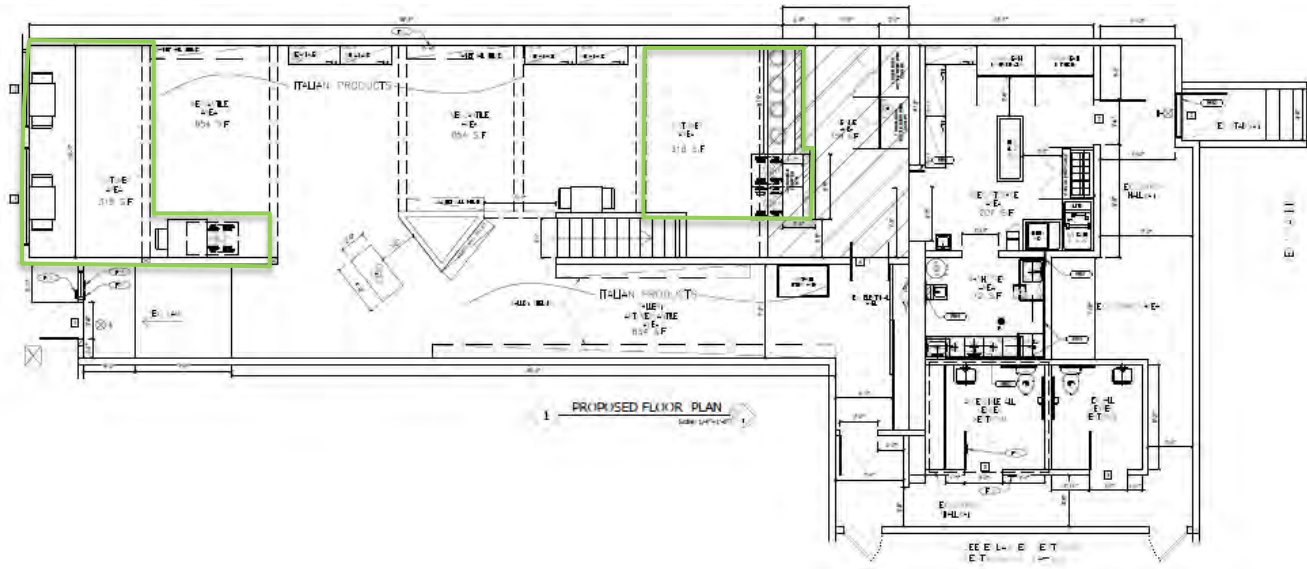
shows the floor plan with the interior dining area outlined in green. The south facing side of the floor plan is the front of the business facing Mission Street.
